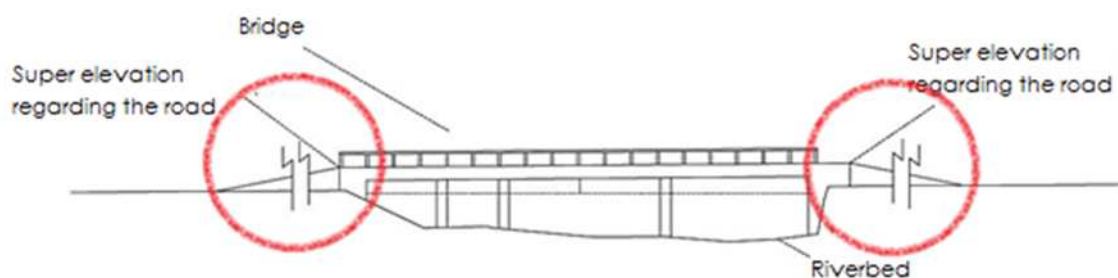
Bridge scheme on super elevation with respect on the approach ends.
